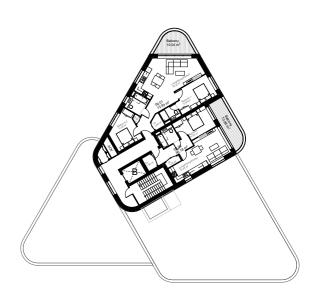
Ground floor plan (not to scale). Source: Stockwool.
